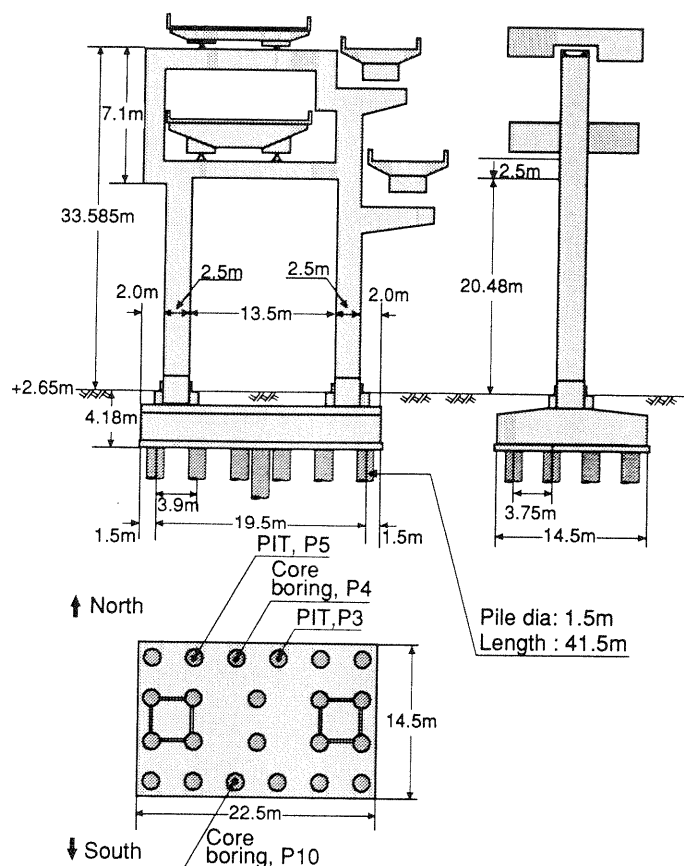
Plan and side views of Pier 211 (Hanshin Highway Authority, 1996)
